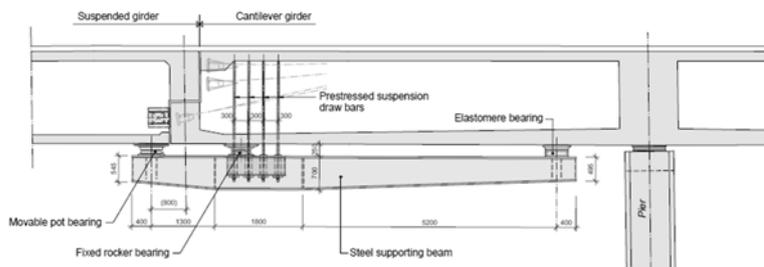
Strengthening with steel cantilever beams beneath the bridge
